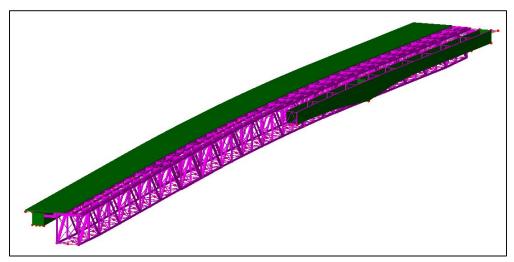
Cutaway of Hillsborough Bridge LUSAS Finite Element Model
